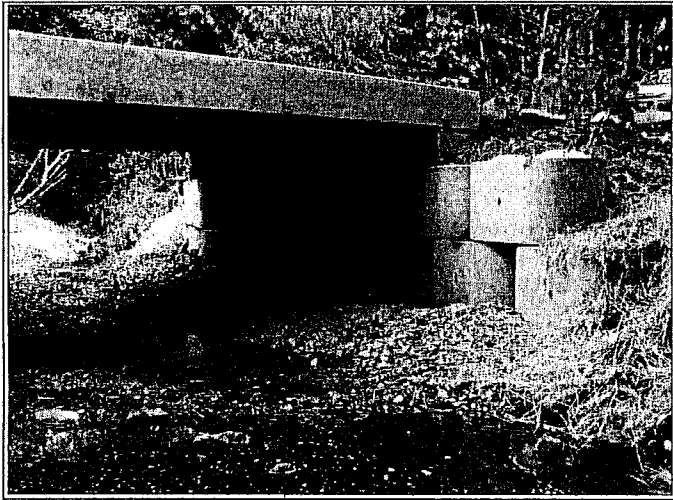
East "Serpentine" Support Abutment Structure With Wingwalls Using Pacific Bridge "Standard" Abutment Units
